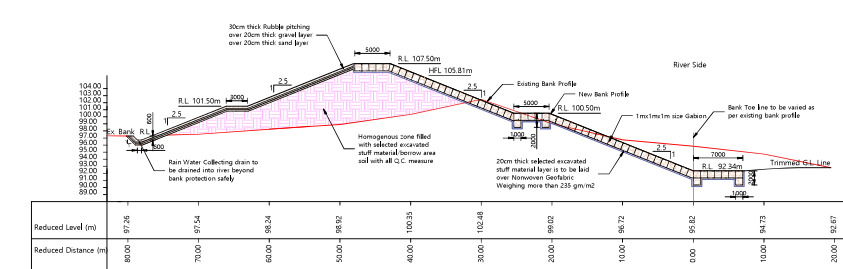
(C) TYPICAL CROSS SECTION OF HIRAPURA BARRAGE GUIDE BANK - U/S LHS @ CH. 120 m (@ LOCAL KOTAR)
